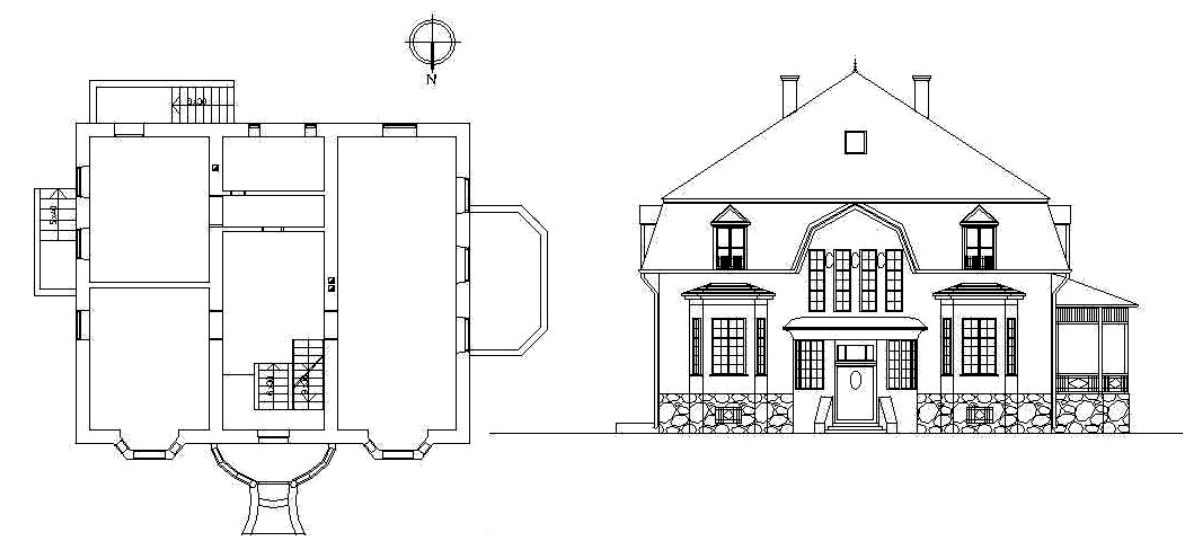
Villa Božić; ground floor plan and elevation view from north.
